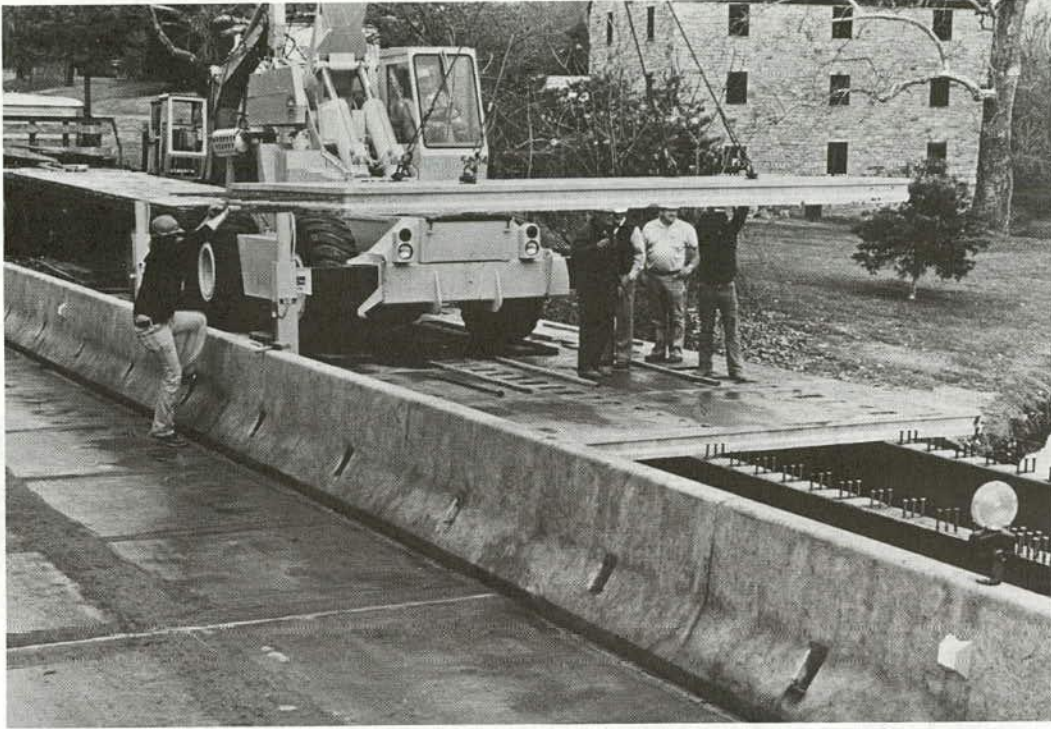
Precast deck panel is lowered onto stringers, which are covered with epoxy mortar (24).
